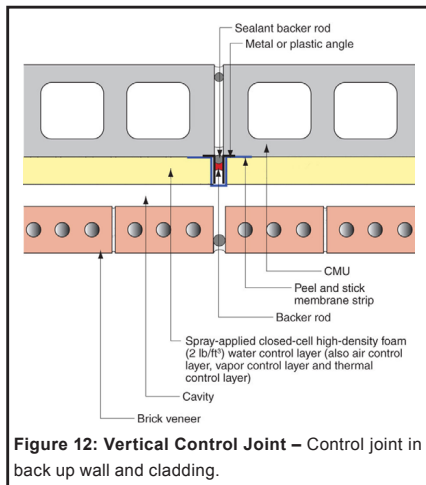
Vertical Control Joint – Control joint in back up wall and cladding.
